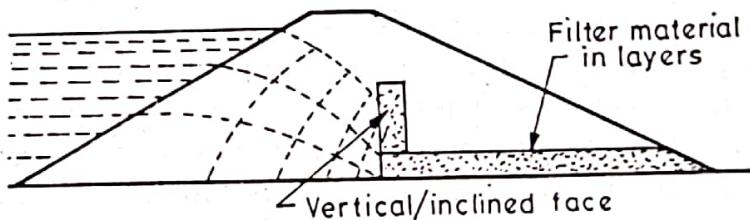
(d). 'Chimney Drain' in Stratified Embankments.
